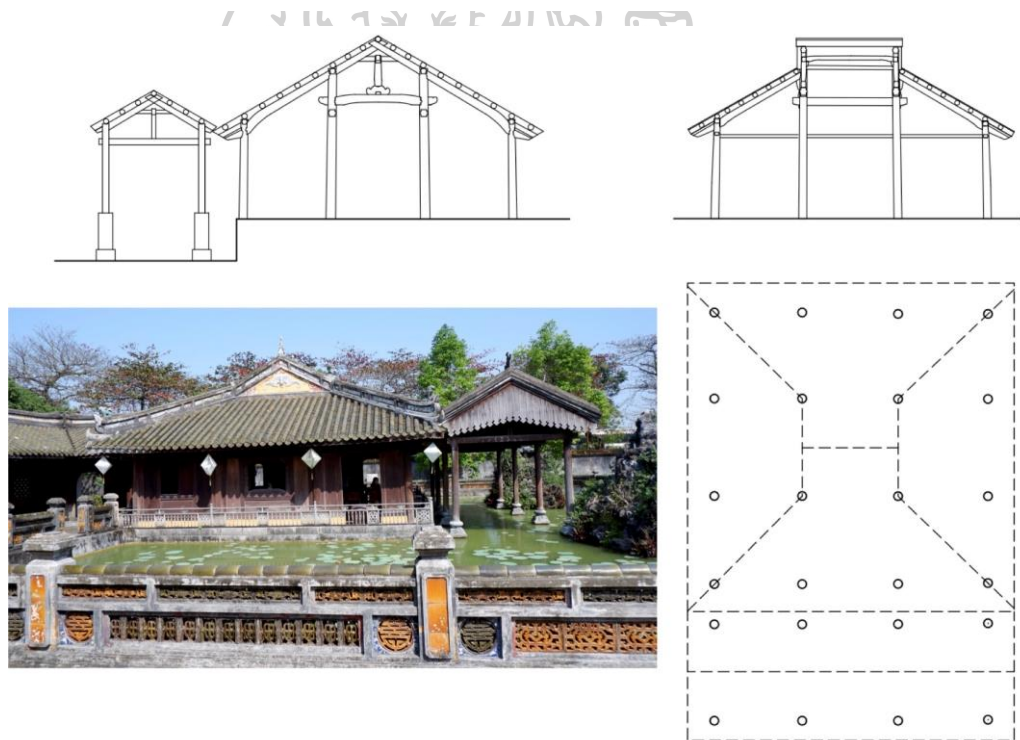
Typical Floating pavilion - “Truong Du Ta” floating pavilion
